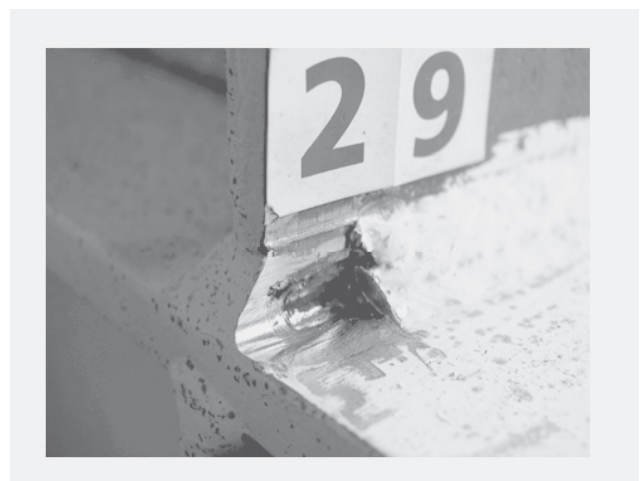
Flange edge imperfection simulated by removing weld metal in BC29.
